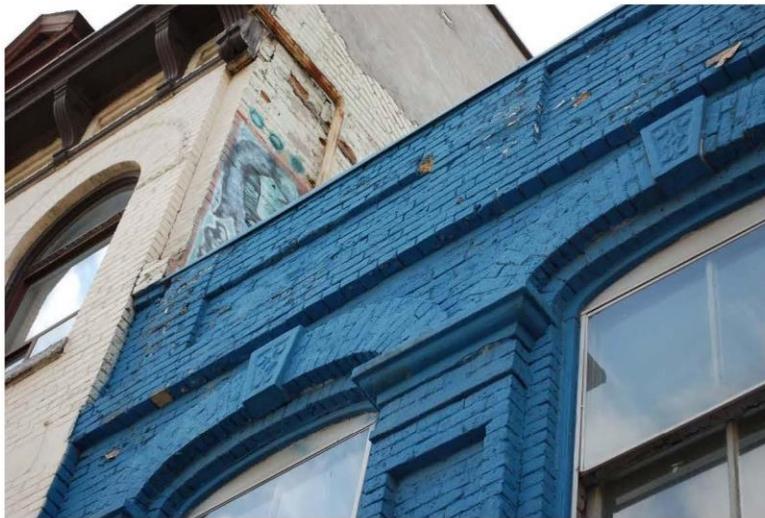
Painted brick piers (not original to the building) on north elevation is in fairly good condition.
